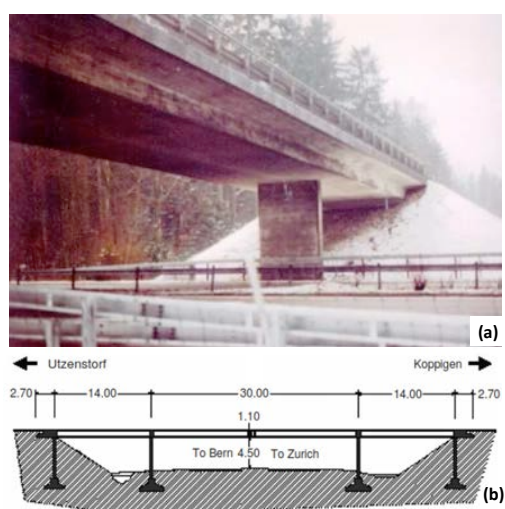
The Z-24 Bridge (a) side view and (b) longitudinal section (Adapted from Peeters & Roeck 2001).
